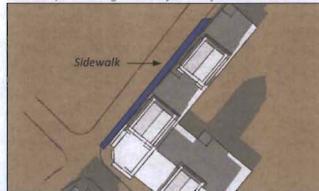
Ensure That 65% of Sidewalk is not in Shadow from 11am to 2pm
